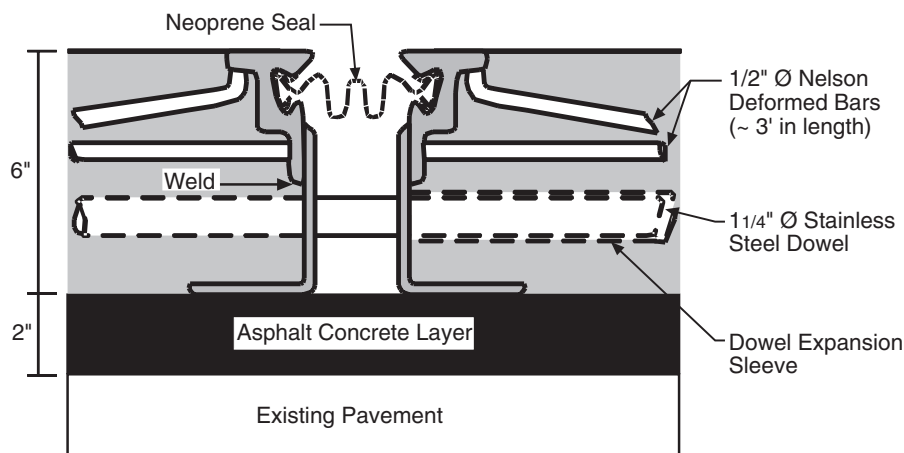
Expansion joint detail for the McLennan County prestressed pavement (Ref 6)
